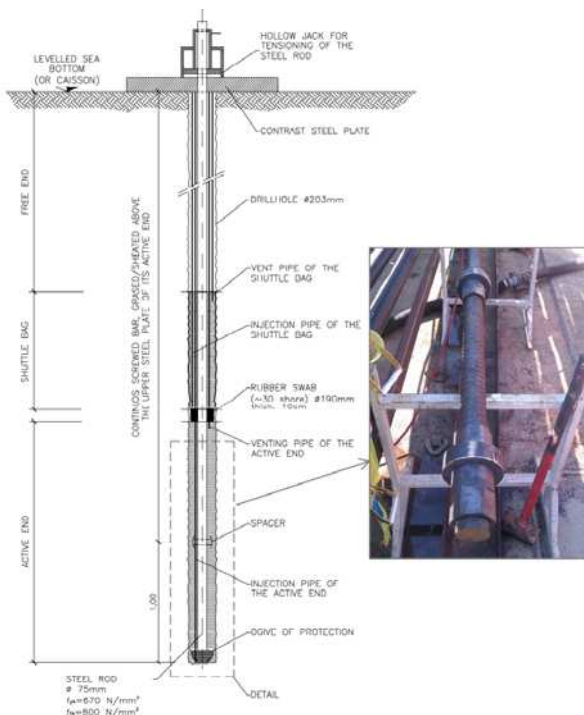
Details of the steel test tendon and of the steel plates for the connection between the unshathed section and the injected grout
